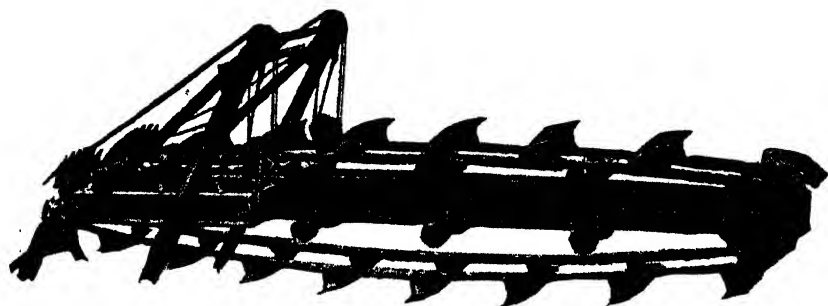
Endless Chain Excavator—Digging Apparatus (for larger machine than Fig. 9).
